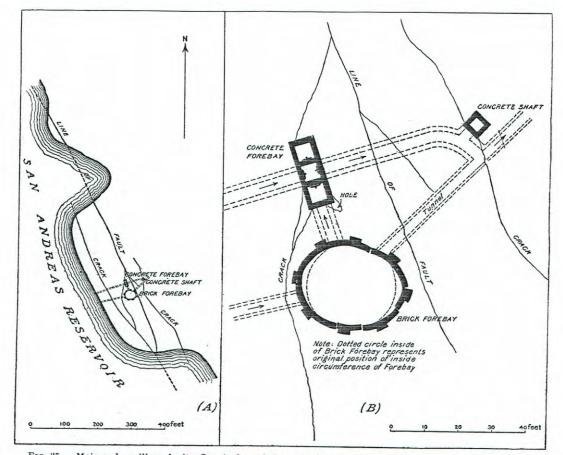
Main and auxilia y faults, San Andreas Lake. A. General Plan. B. Detail. After H. Schussler.
